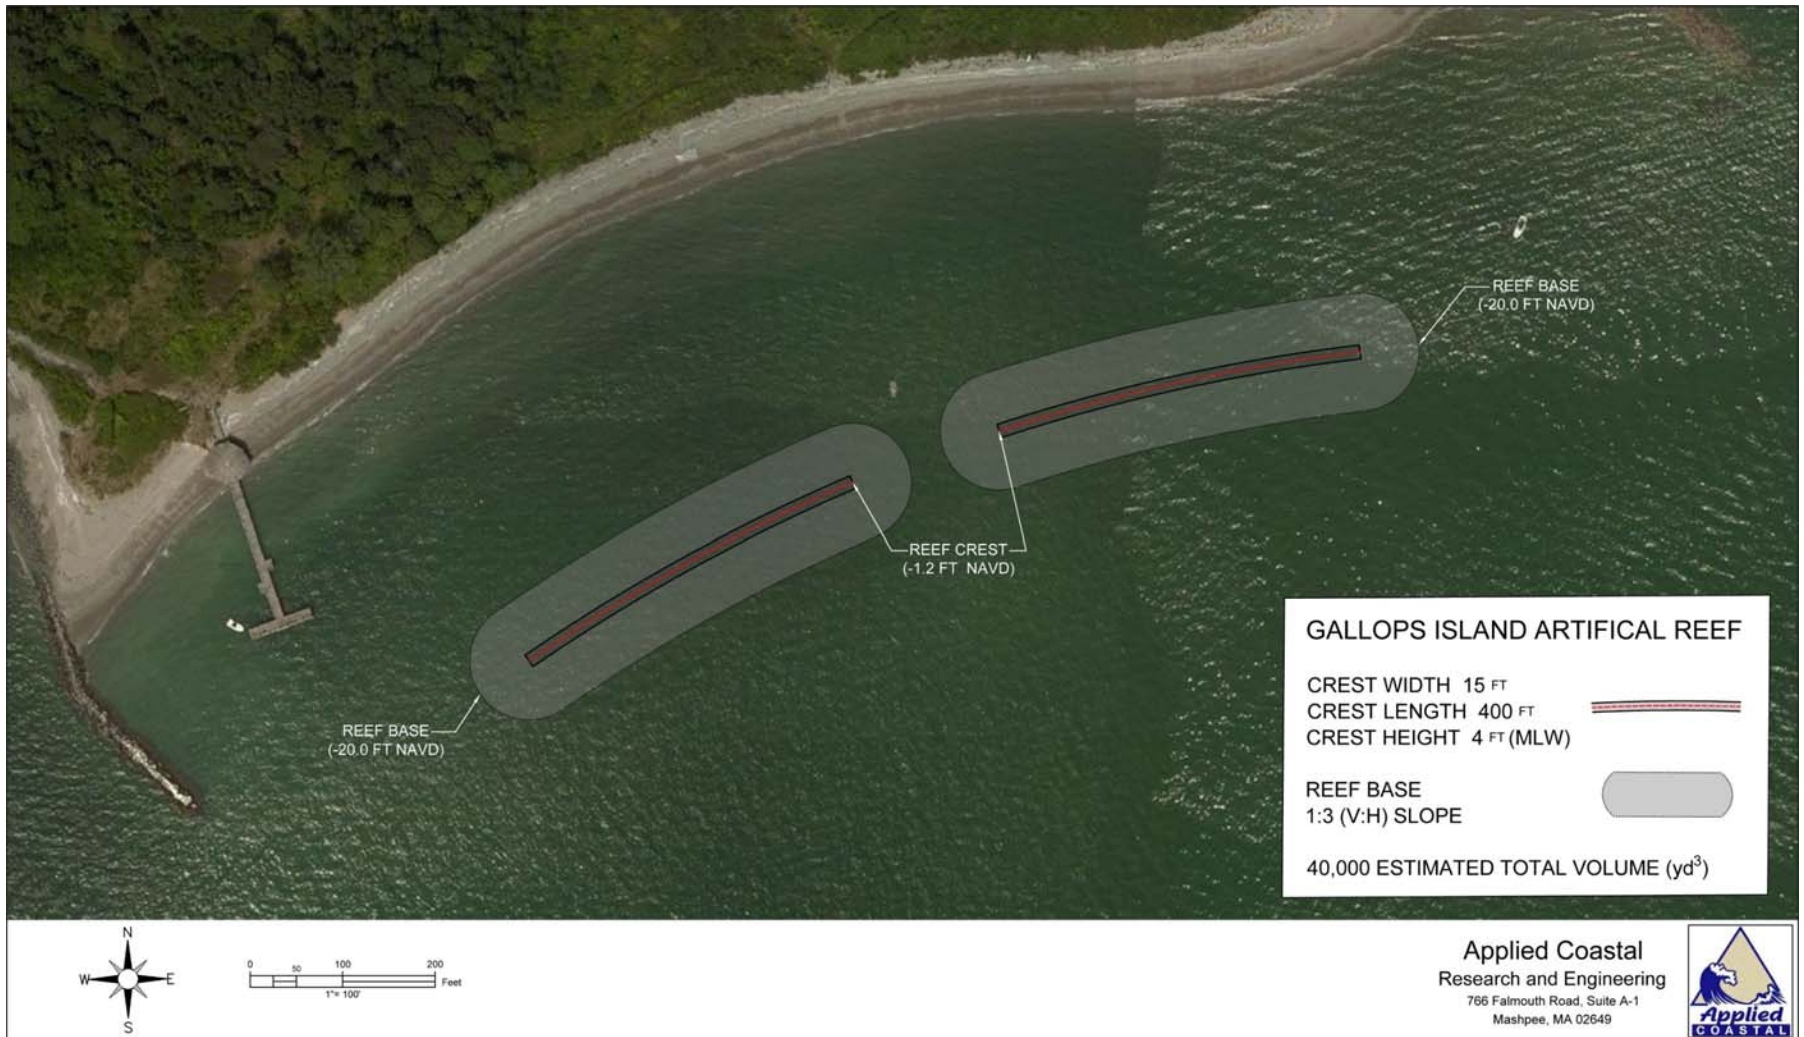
Conceptual plan of the preferred reef alternative for Gallops Island.
